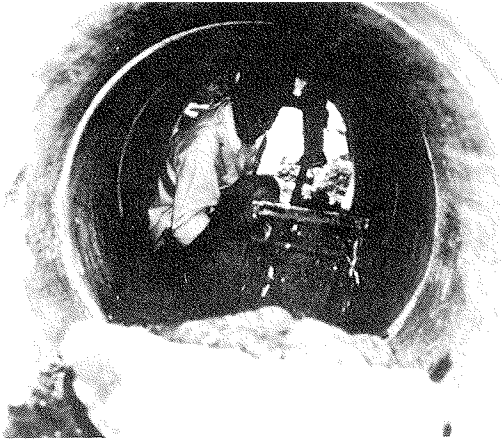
Cleaning Inside of Concrete Culvert (Honduras).
